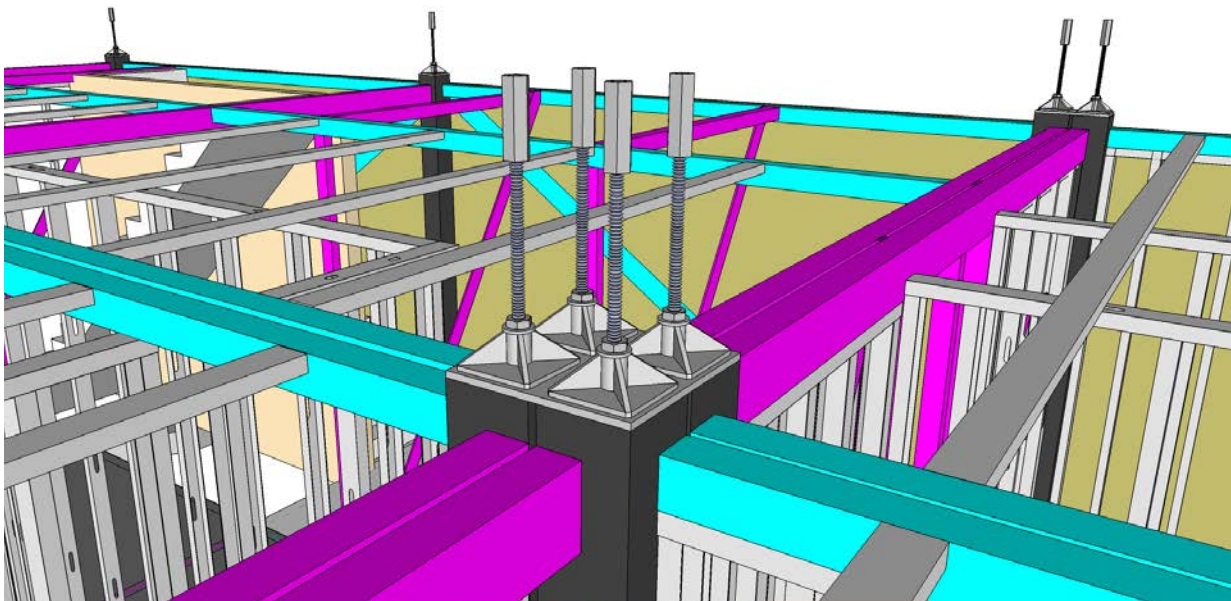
Long nut added to extend steel rod through second floor Modules
